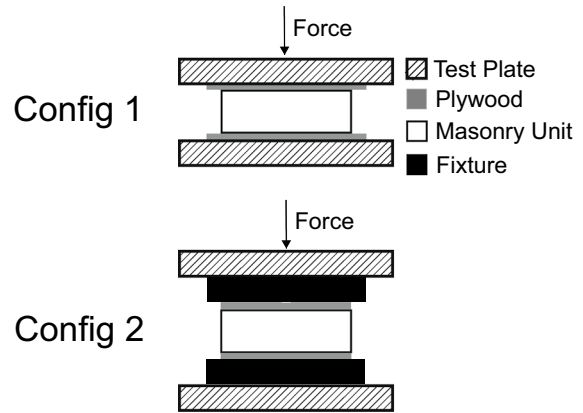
Two configurations for mechanical testing. Configuration 1, Crush, tests the strength of one unit. Configuration 2, Spanning, tests the strength of one unit when in an assembly layout. Interlocking features for FP and PC units are on the bottom faces of each configuration
